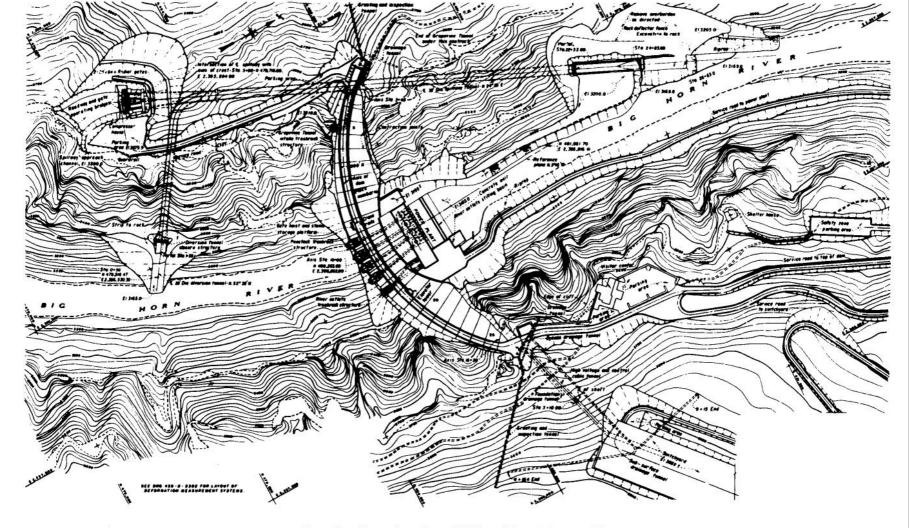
Plan and sections of Yellowtail Dam. (sheet 1 of 2)
